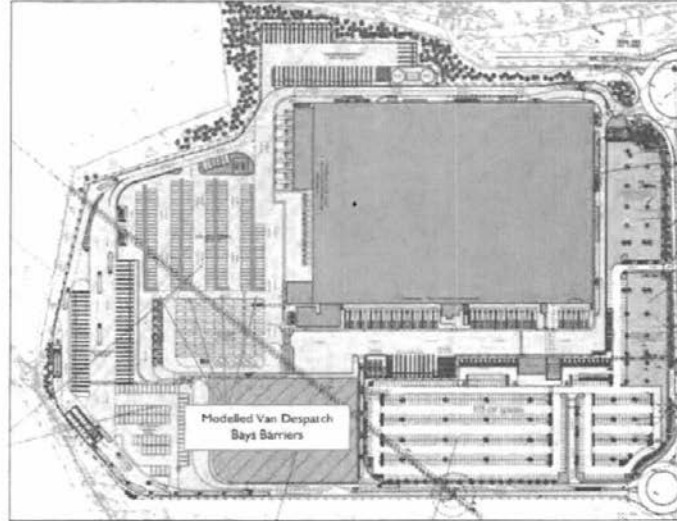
September 2014 draft letter – southern trailer parking barriers
